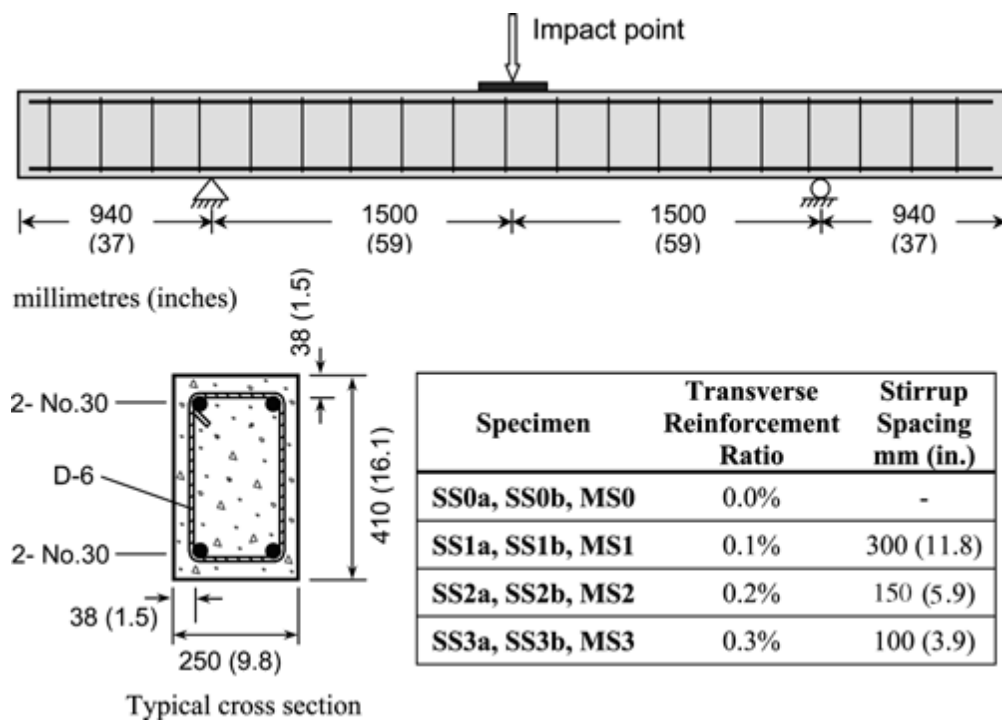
Specimen details (Saatci and Vecchio, 2009)
